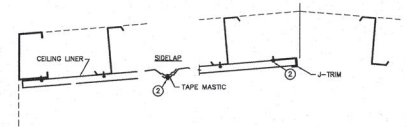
DETAIL: TRIM ALONG HIGH EAVE OF LEAN-TO-BUILDING
